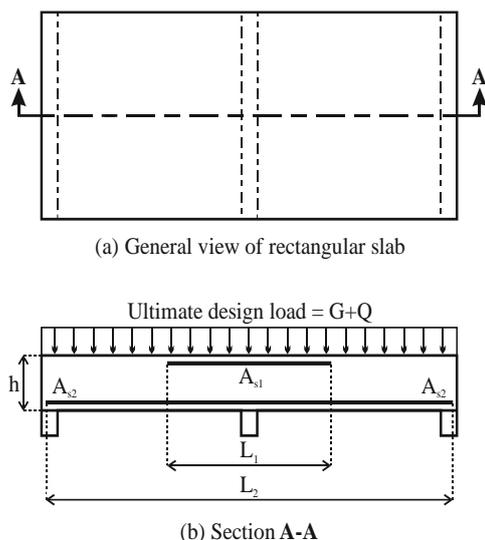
Reinforced concrete slab: (a) General view, (b) Section A-A.
